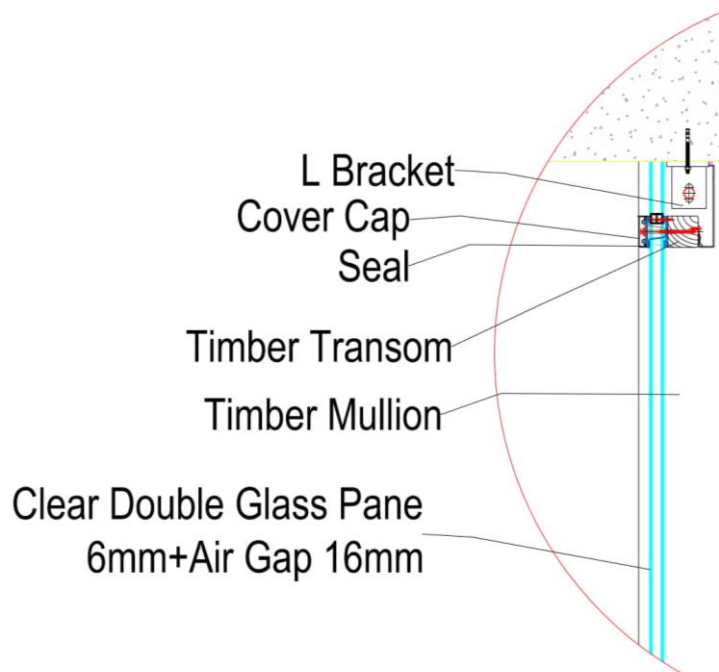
Curtain Wall Vertical Section Detail
